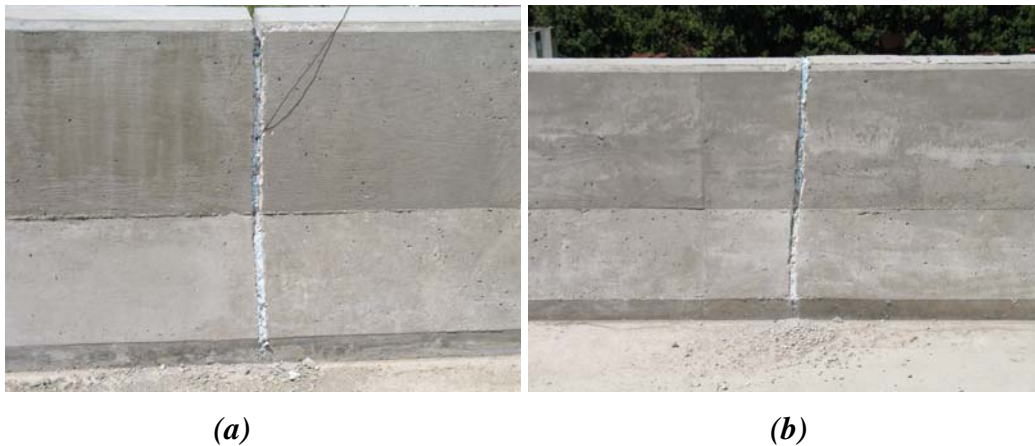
a) Vertical construction joint in the west rail at the center b) skewed construction joint north of the centerline on the east rail
